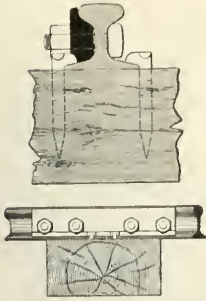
Rail Joint with Single Splice Bar; Copenhagen-Roskilde Line, 1847.
